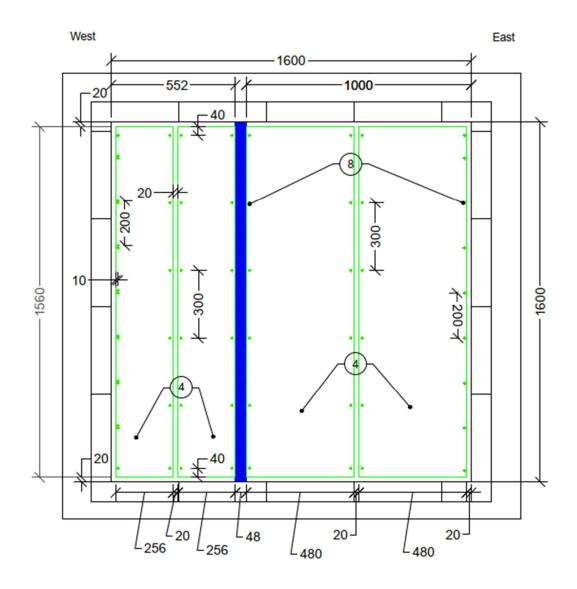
Elevation view of the third layer of plaster board (unexposed side)
